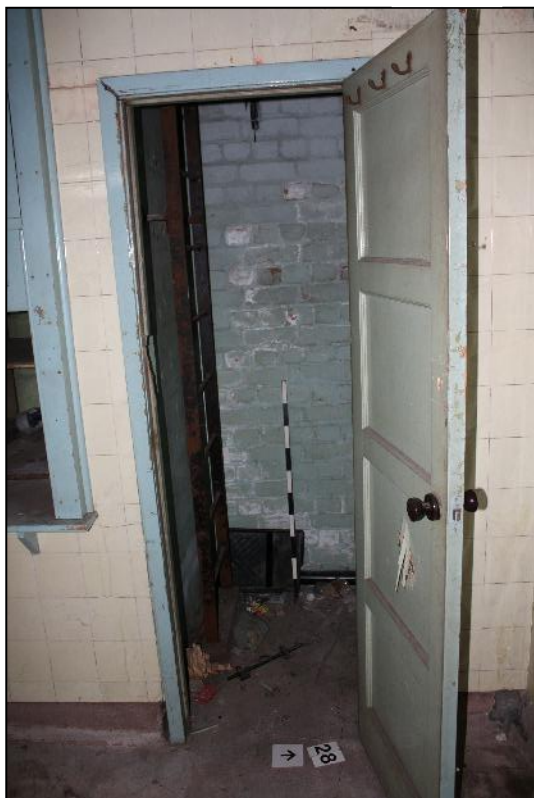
Access point to water-tower and vertical ladder rising to flat roof above the three-storey extent of Nos. 200 and 201 High Street.
